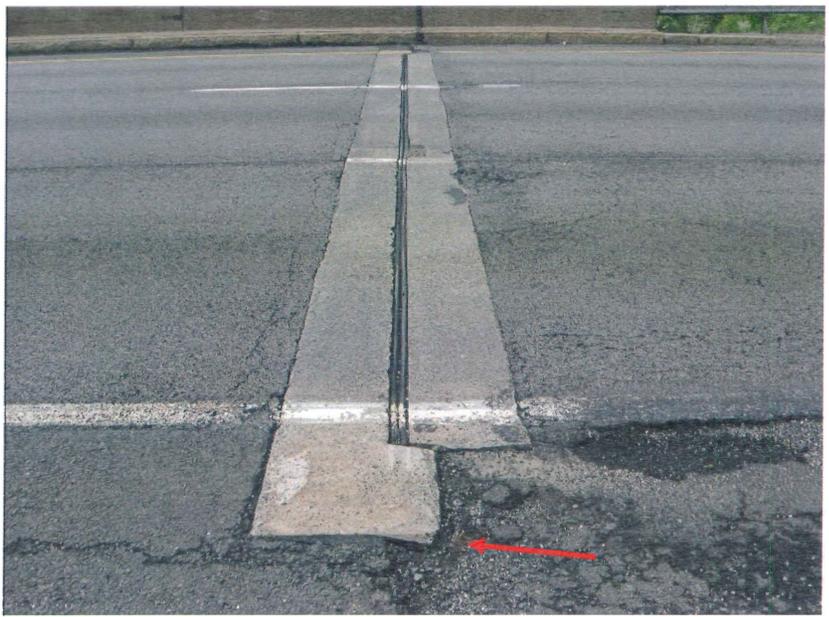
Deck joint at the East Abutment. Note that the deck joint does not extend for full length and the overlay exhibits minor potholes in the right shoulder.
